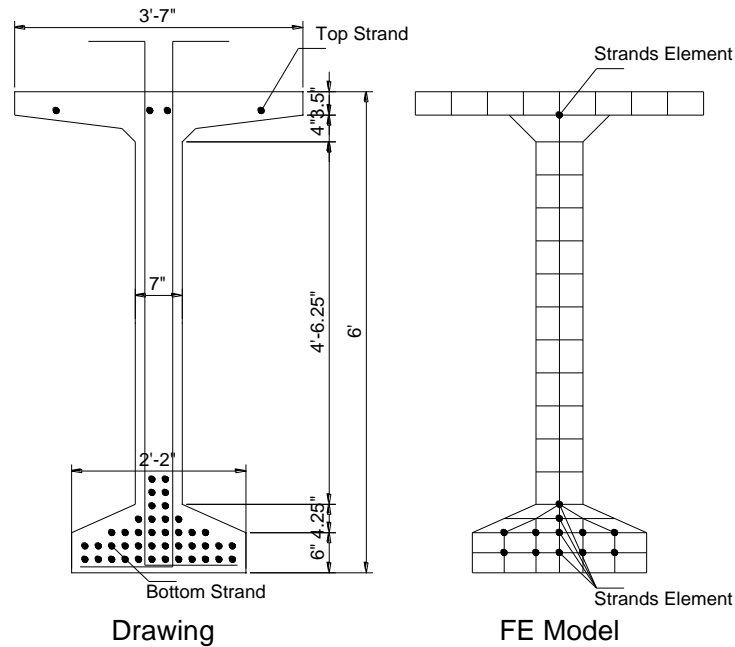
Cross-Sectional View of Archetype 4 Bridge Girder at Mid-Span: (Left) Actual Strands Distribution and (Right) Strand Elements in FE Model
